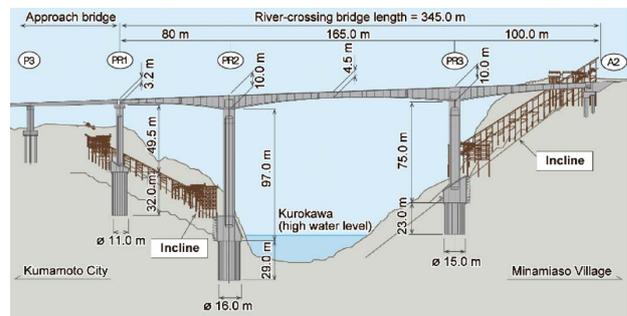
General view of the Aso Ohashi Bridge (river-crossing section)
